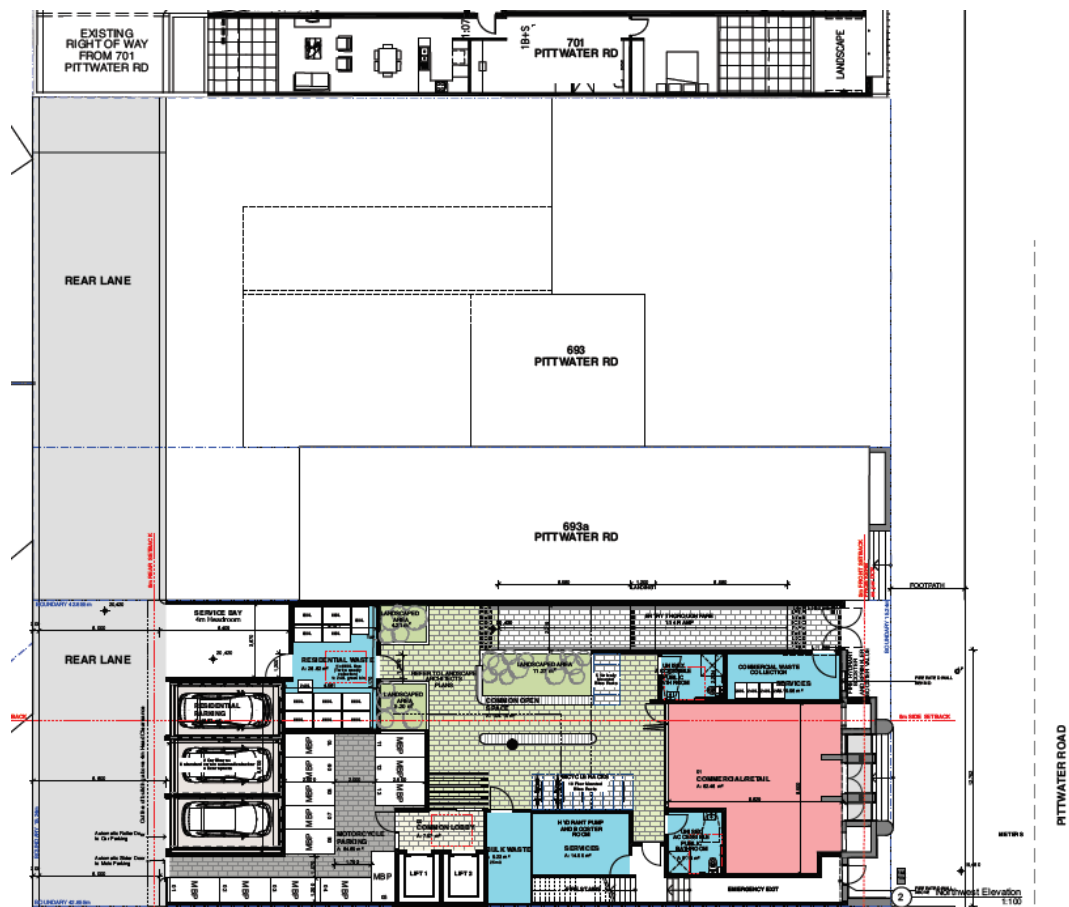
Revision C Ground Floor plan – future (DA 110)
